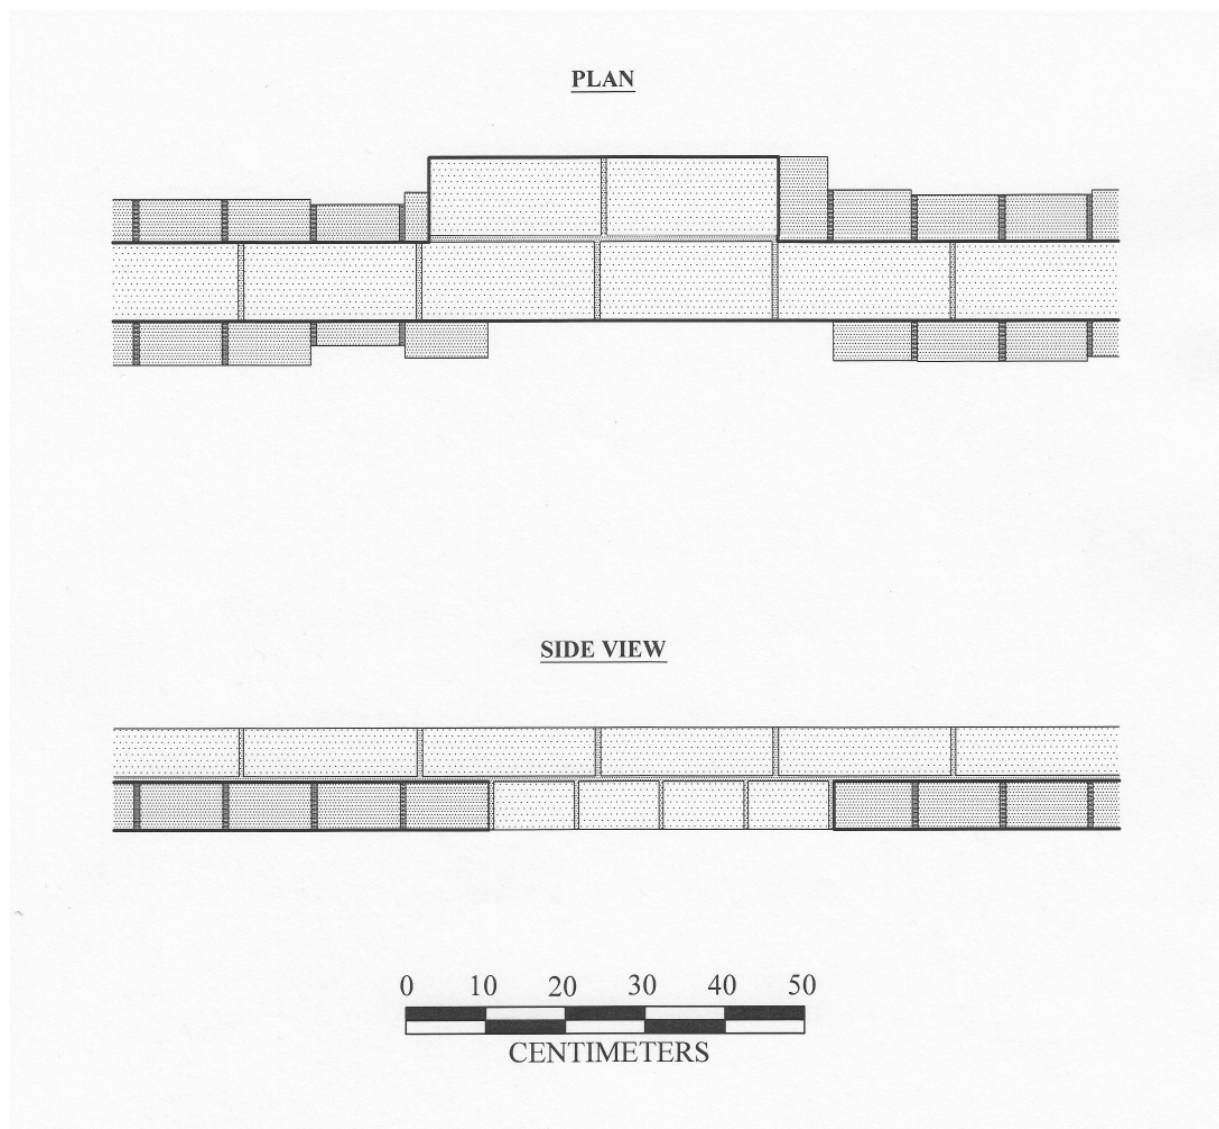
Details of the east foundation wall (original, front section) of House F. The double-wide brick pier and adjacent single-wide brick “curtain” wall were constructed in a single episode.
